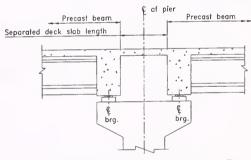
Arrangement of Tie Back Reinforcement at Fixed Bearing
